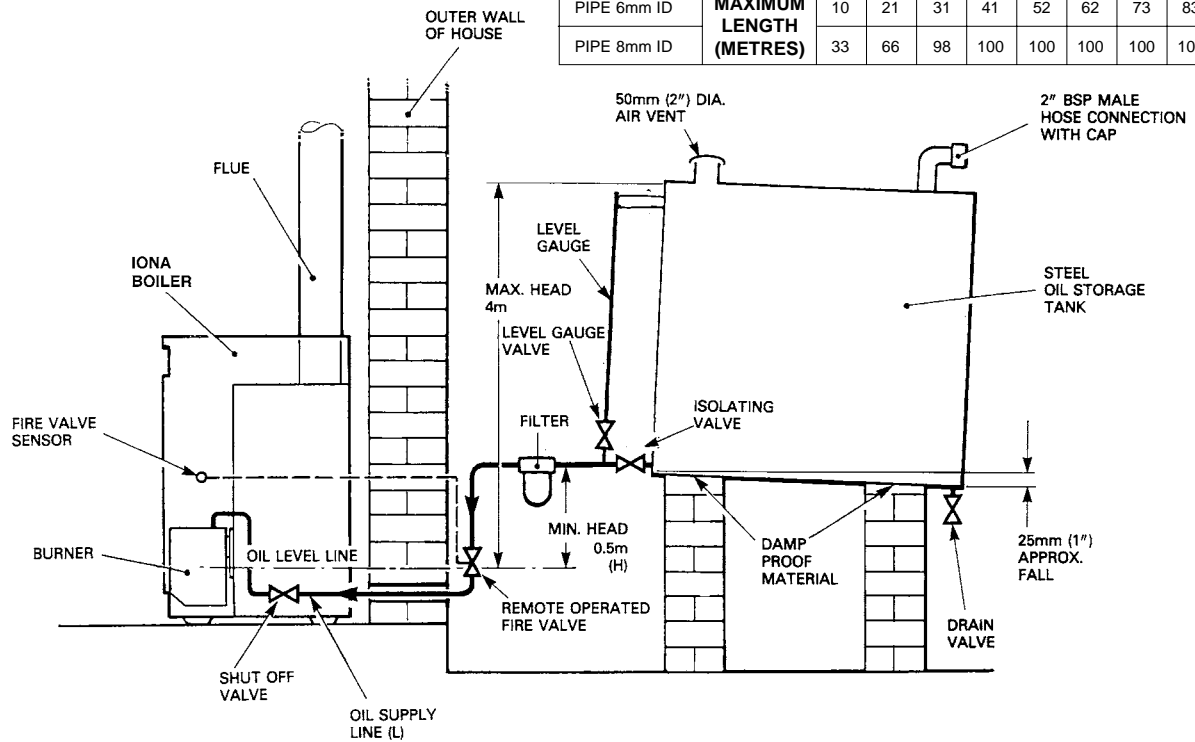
SINGLE PIPE OIL SUPPLY INSTALLATION
